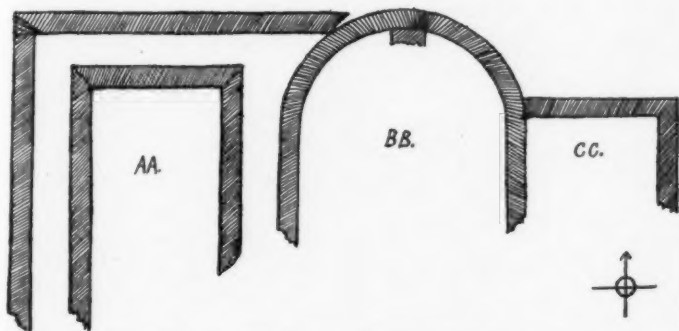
STATION VILLA. ROOMS AA, BB, CC, PLAN.
